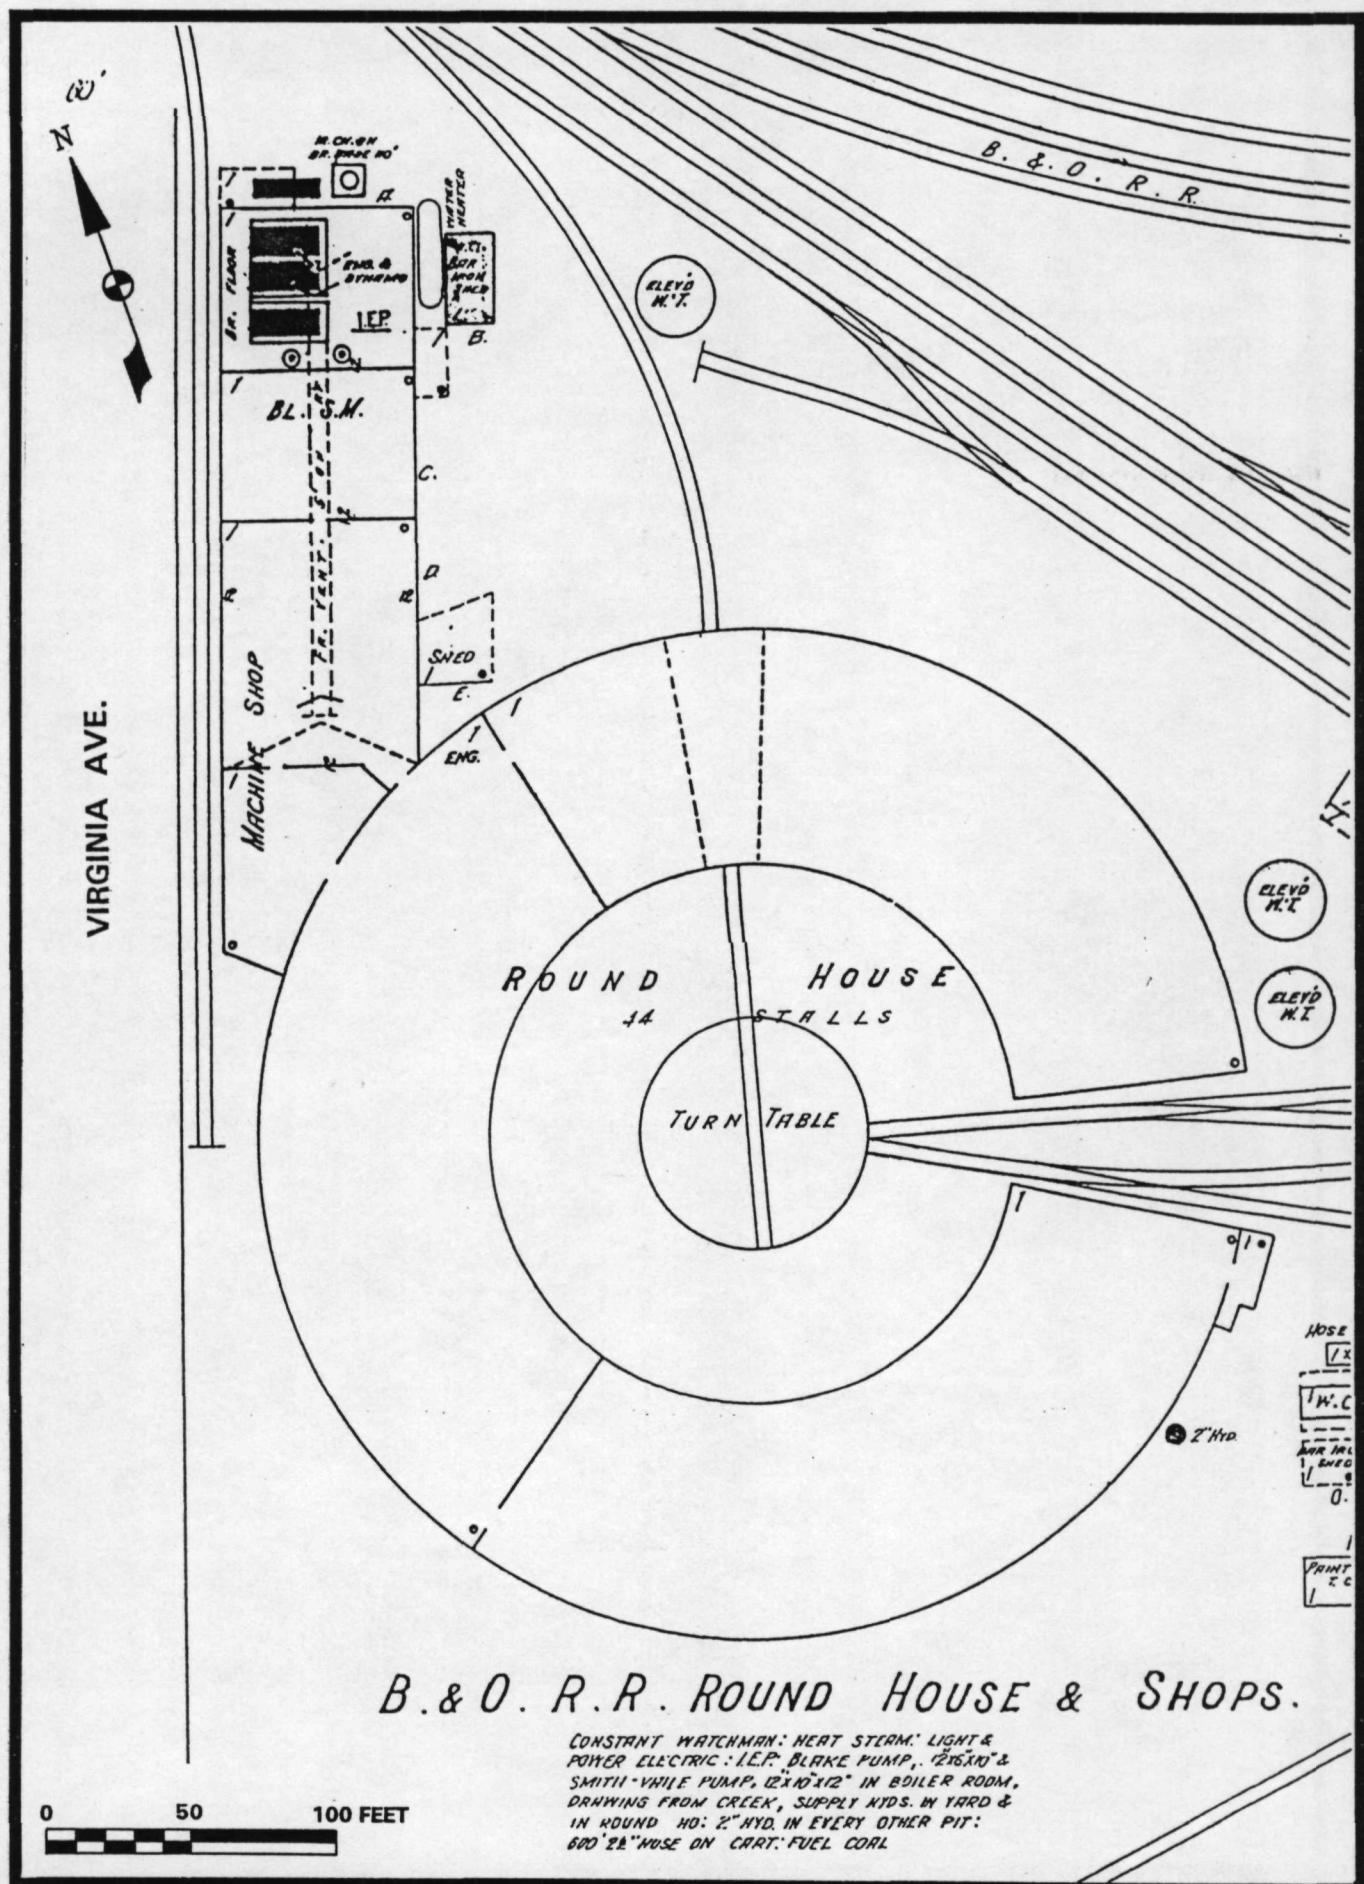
Plan of the 1896 B&O Roundhouse and Machine Shop Facility Along Virginia Avenue, 1910
